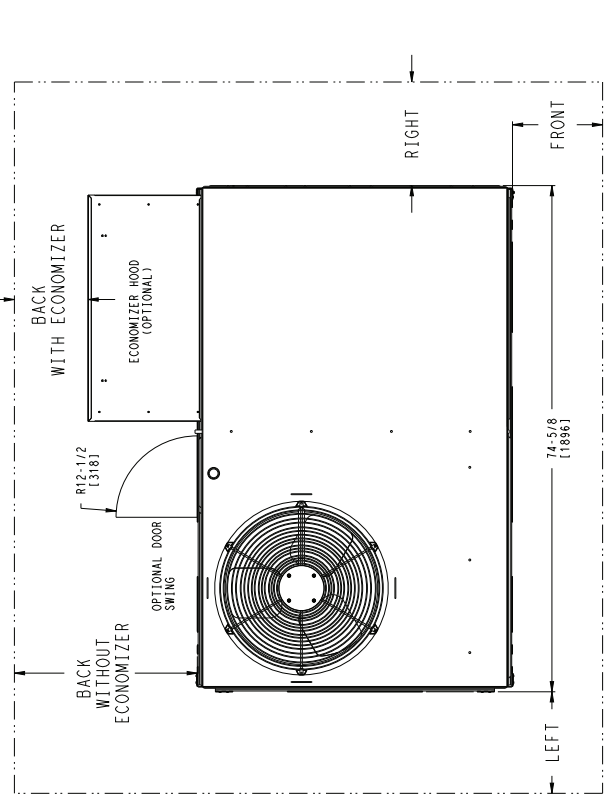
Dimension Drawing for Units Built Prior to 4/15/19
